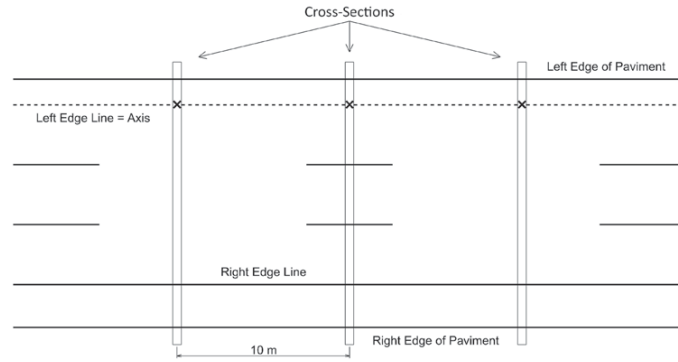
Plan view of a road and its component elements, where the cross sections are separated by 10 m from one another.
